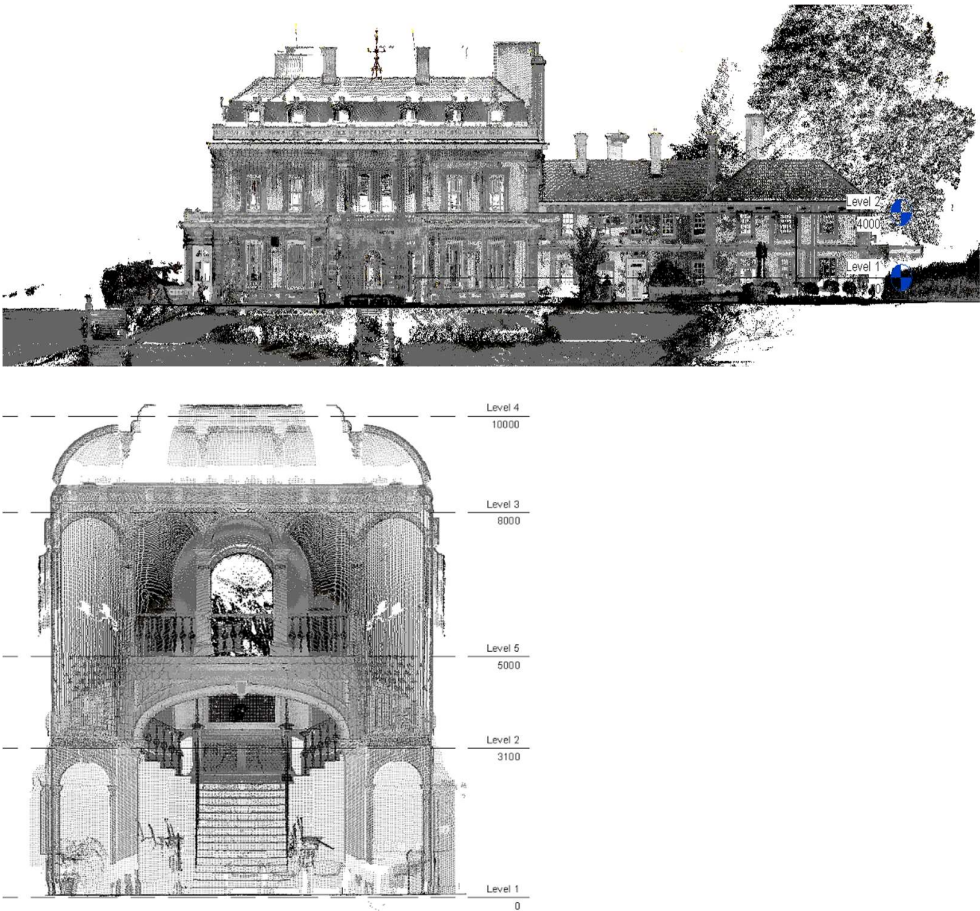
(a) Eastern elevation of Headington Hill Building; (b) Cross-section of the main hall
